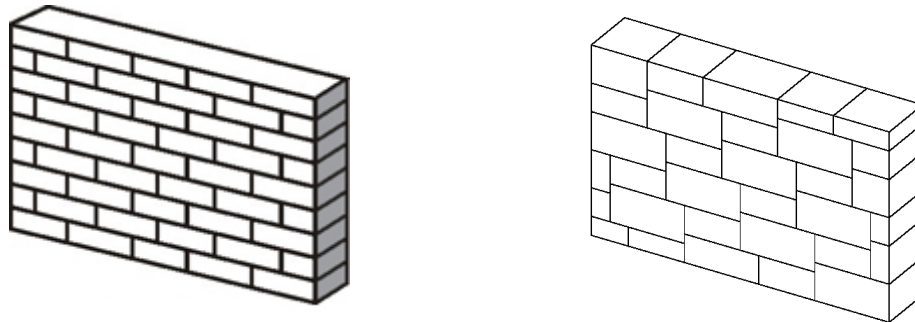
On the left a running bond masonry wall and on the right the interlocking masonry wall presented herein.
